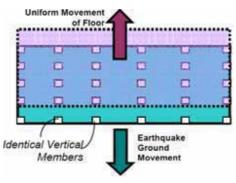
Identical vertical members placed uniformly in plan of building cause all points on the floor to move by same amount
